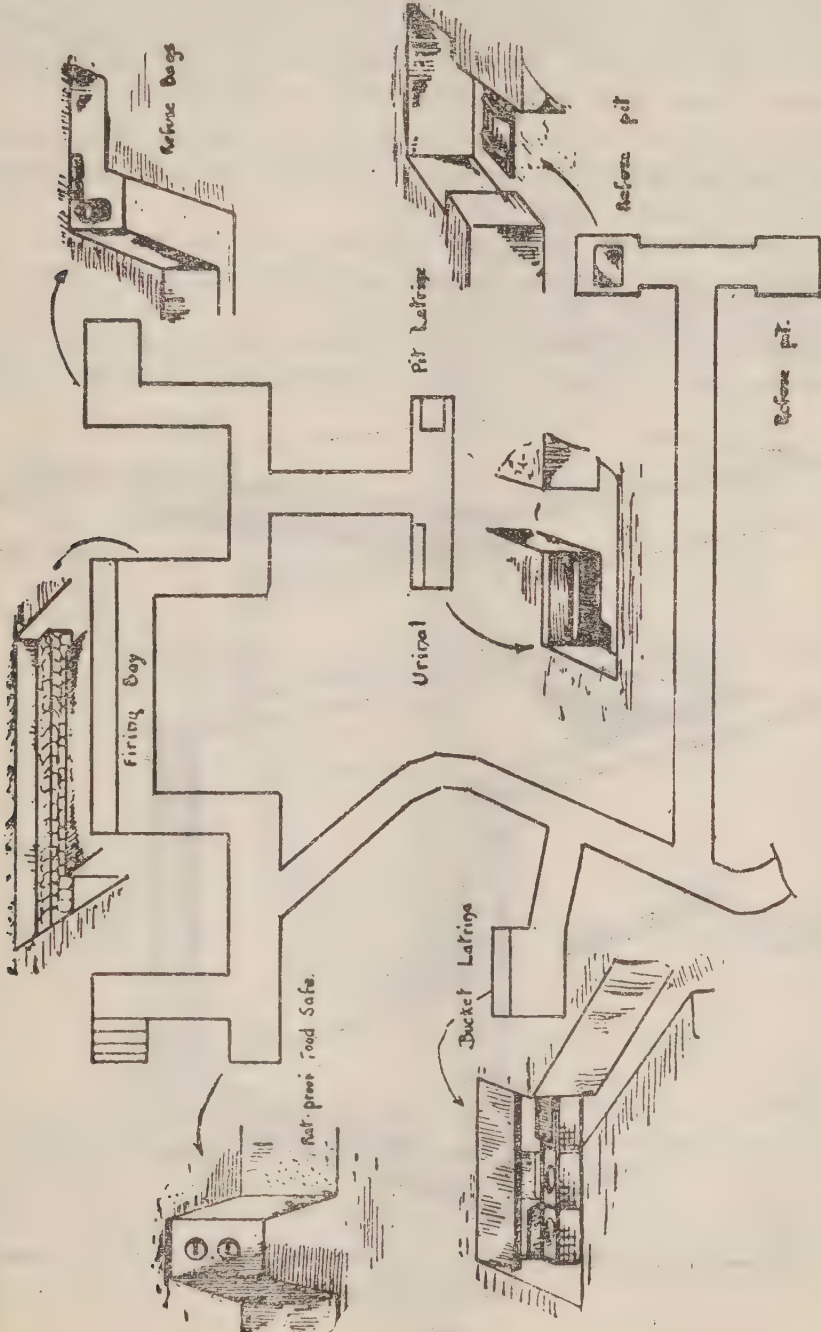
Plan of Trenches—showing sanitary arrangements.
